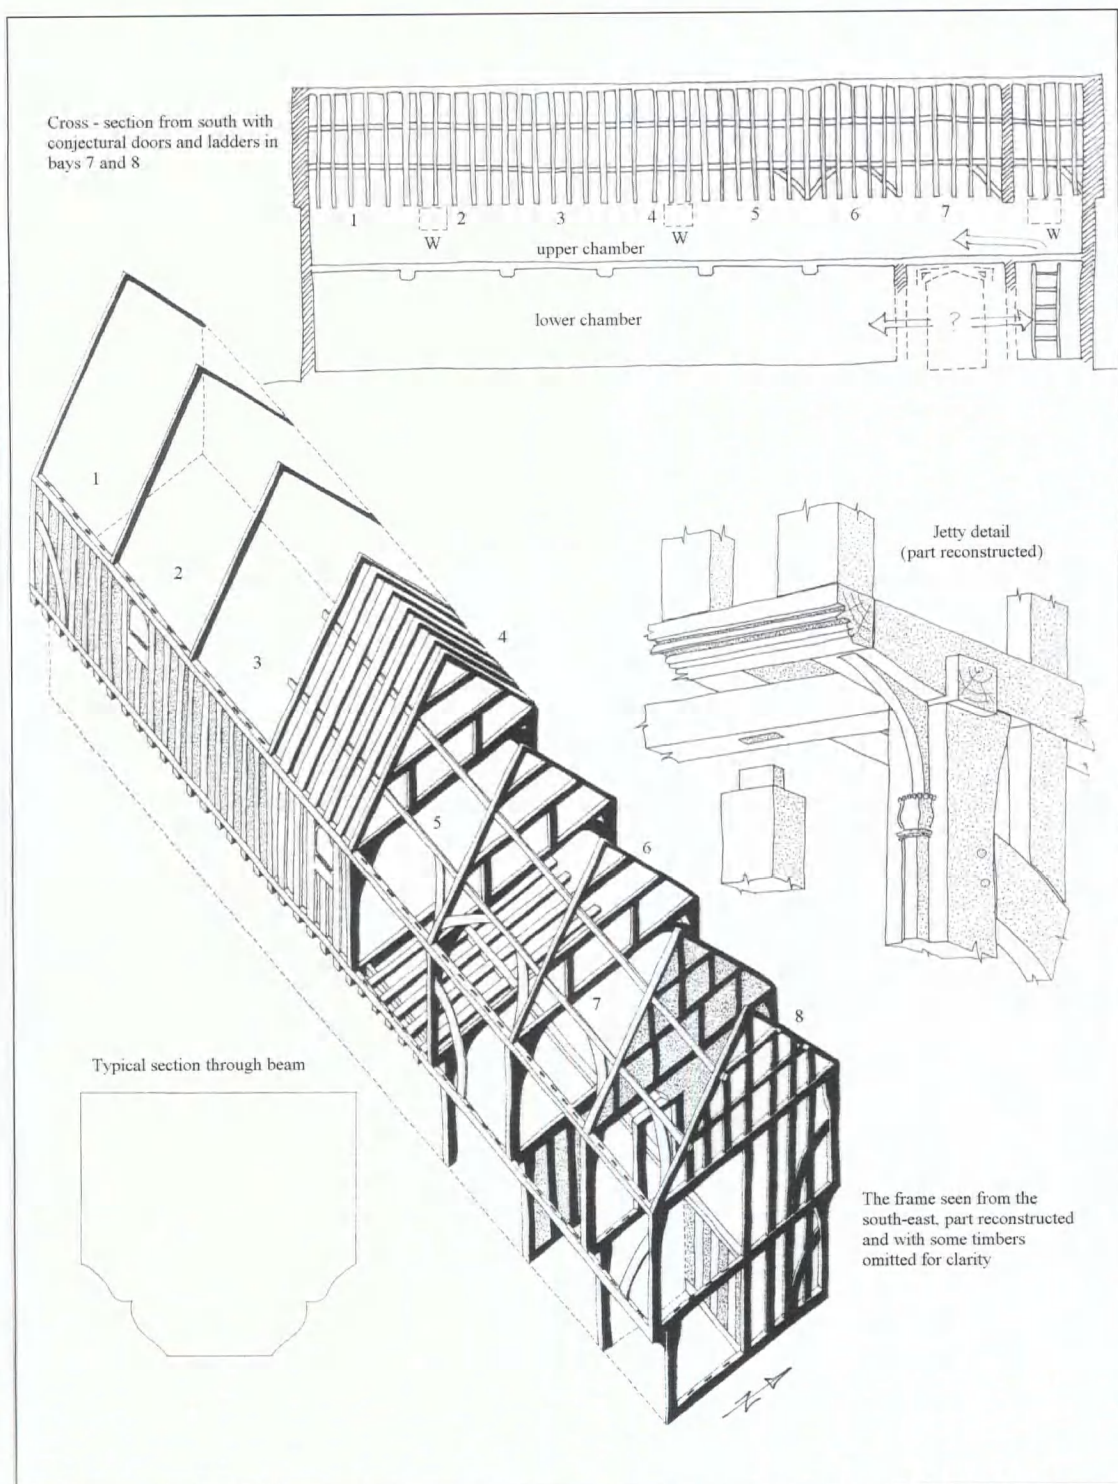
Timber Frame and Details at the "Town House", Kempston Church End
